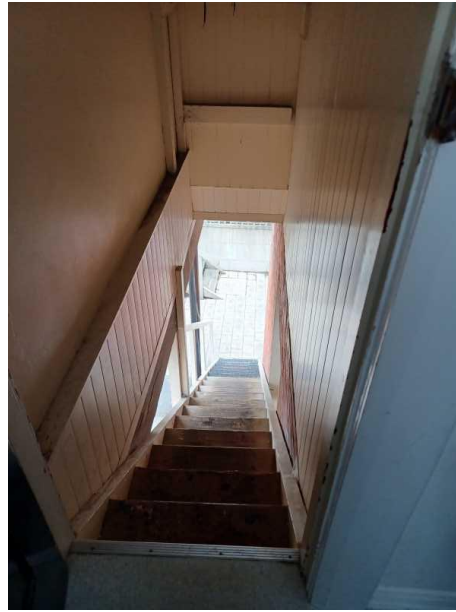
View from the first floor down the external stair. Note the vertical T&G lining.
